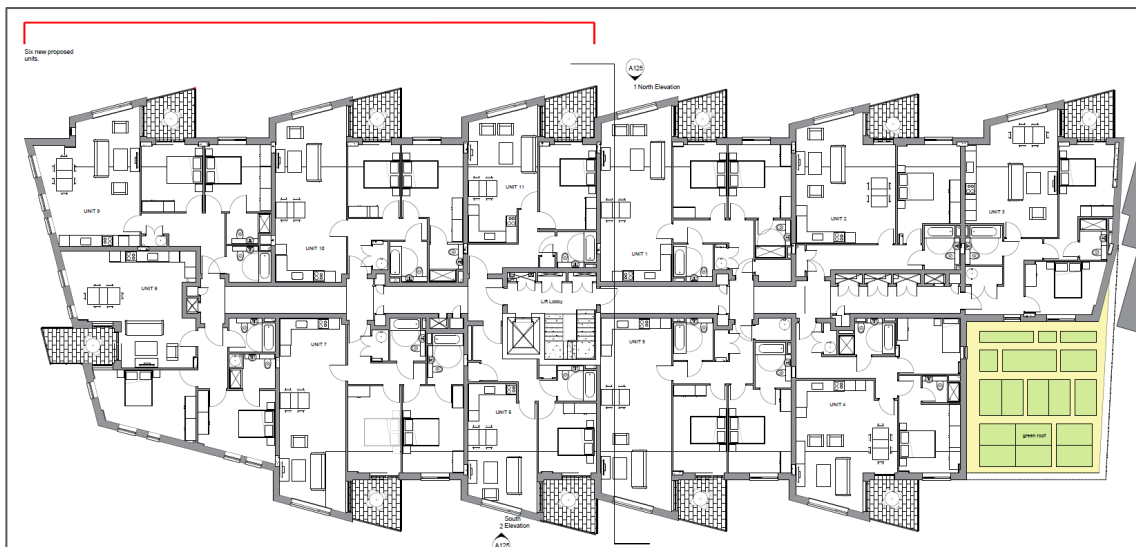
Proposed Ground Floor Plan (FORMstudio Architects, 2020)
